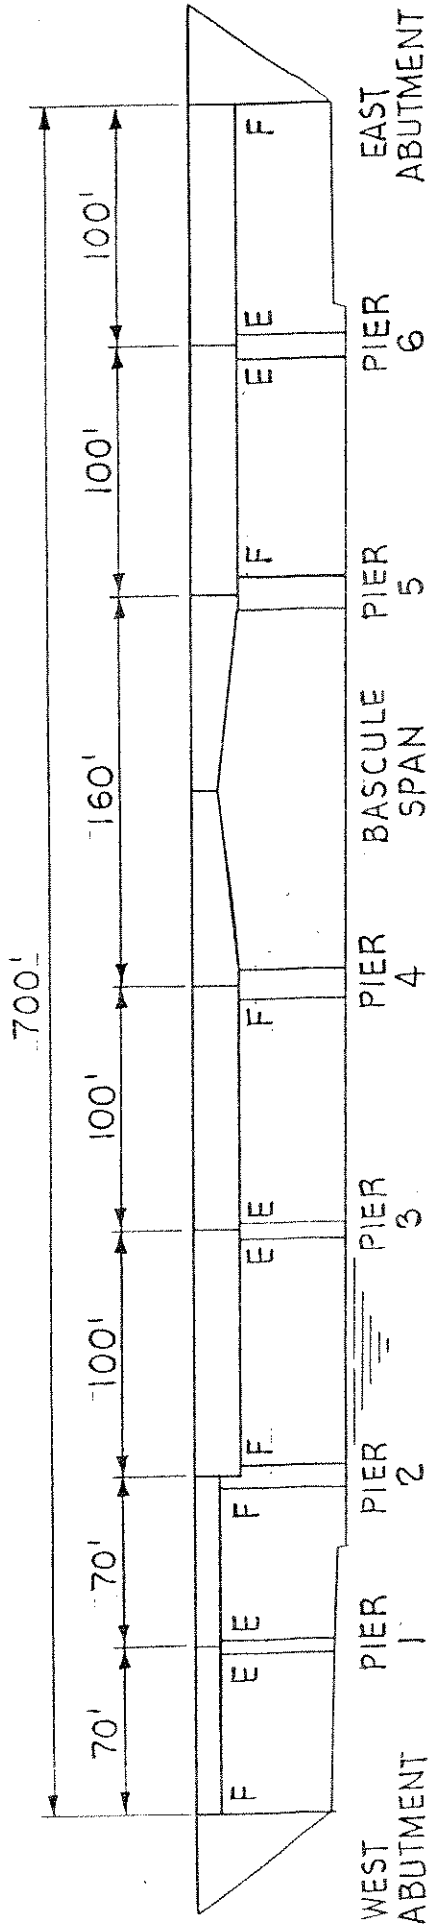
ELEVATION OF BRIDGE NO. 3
